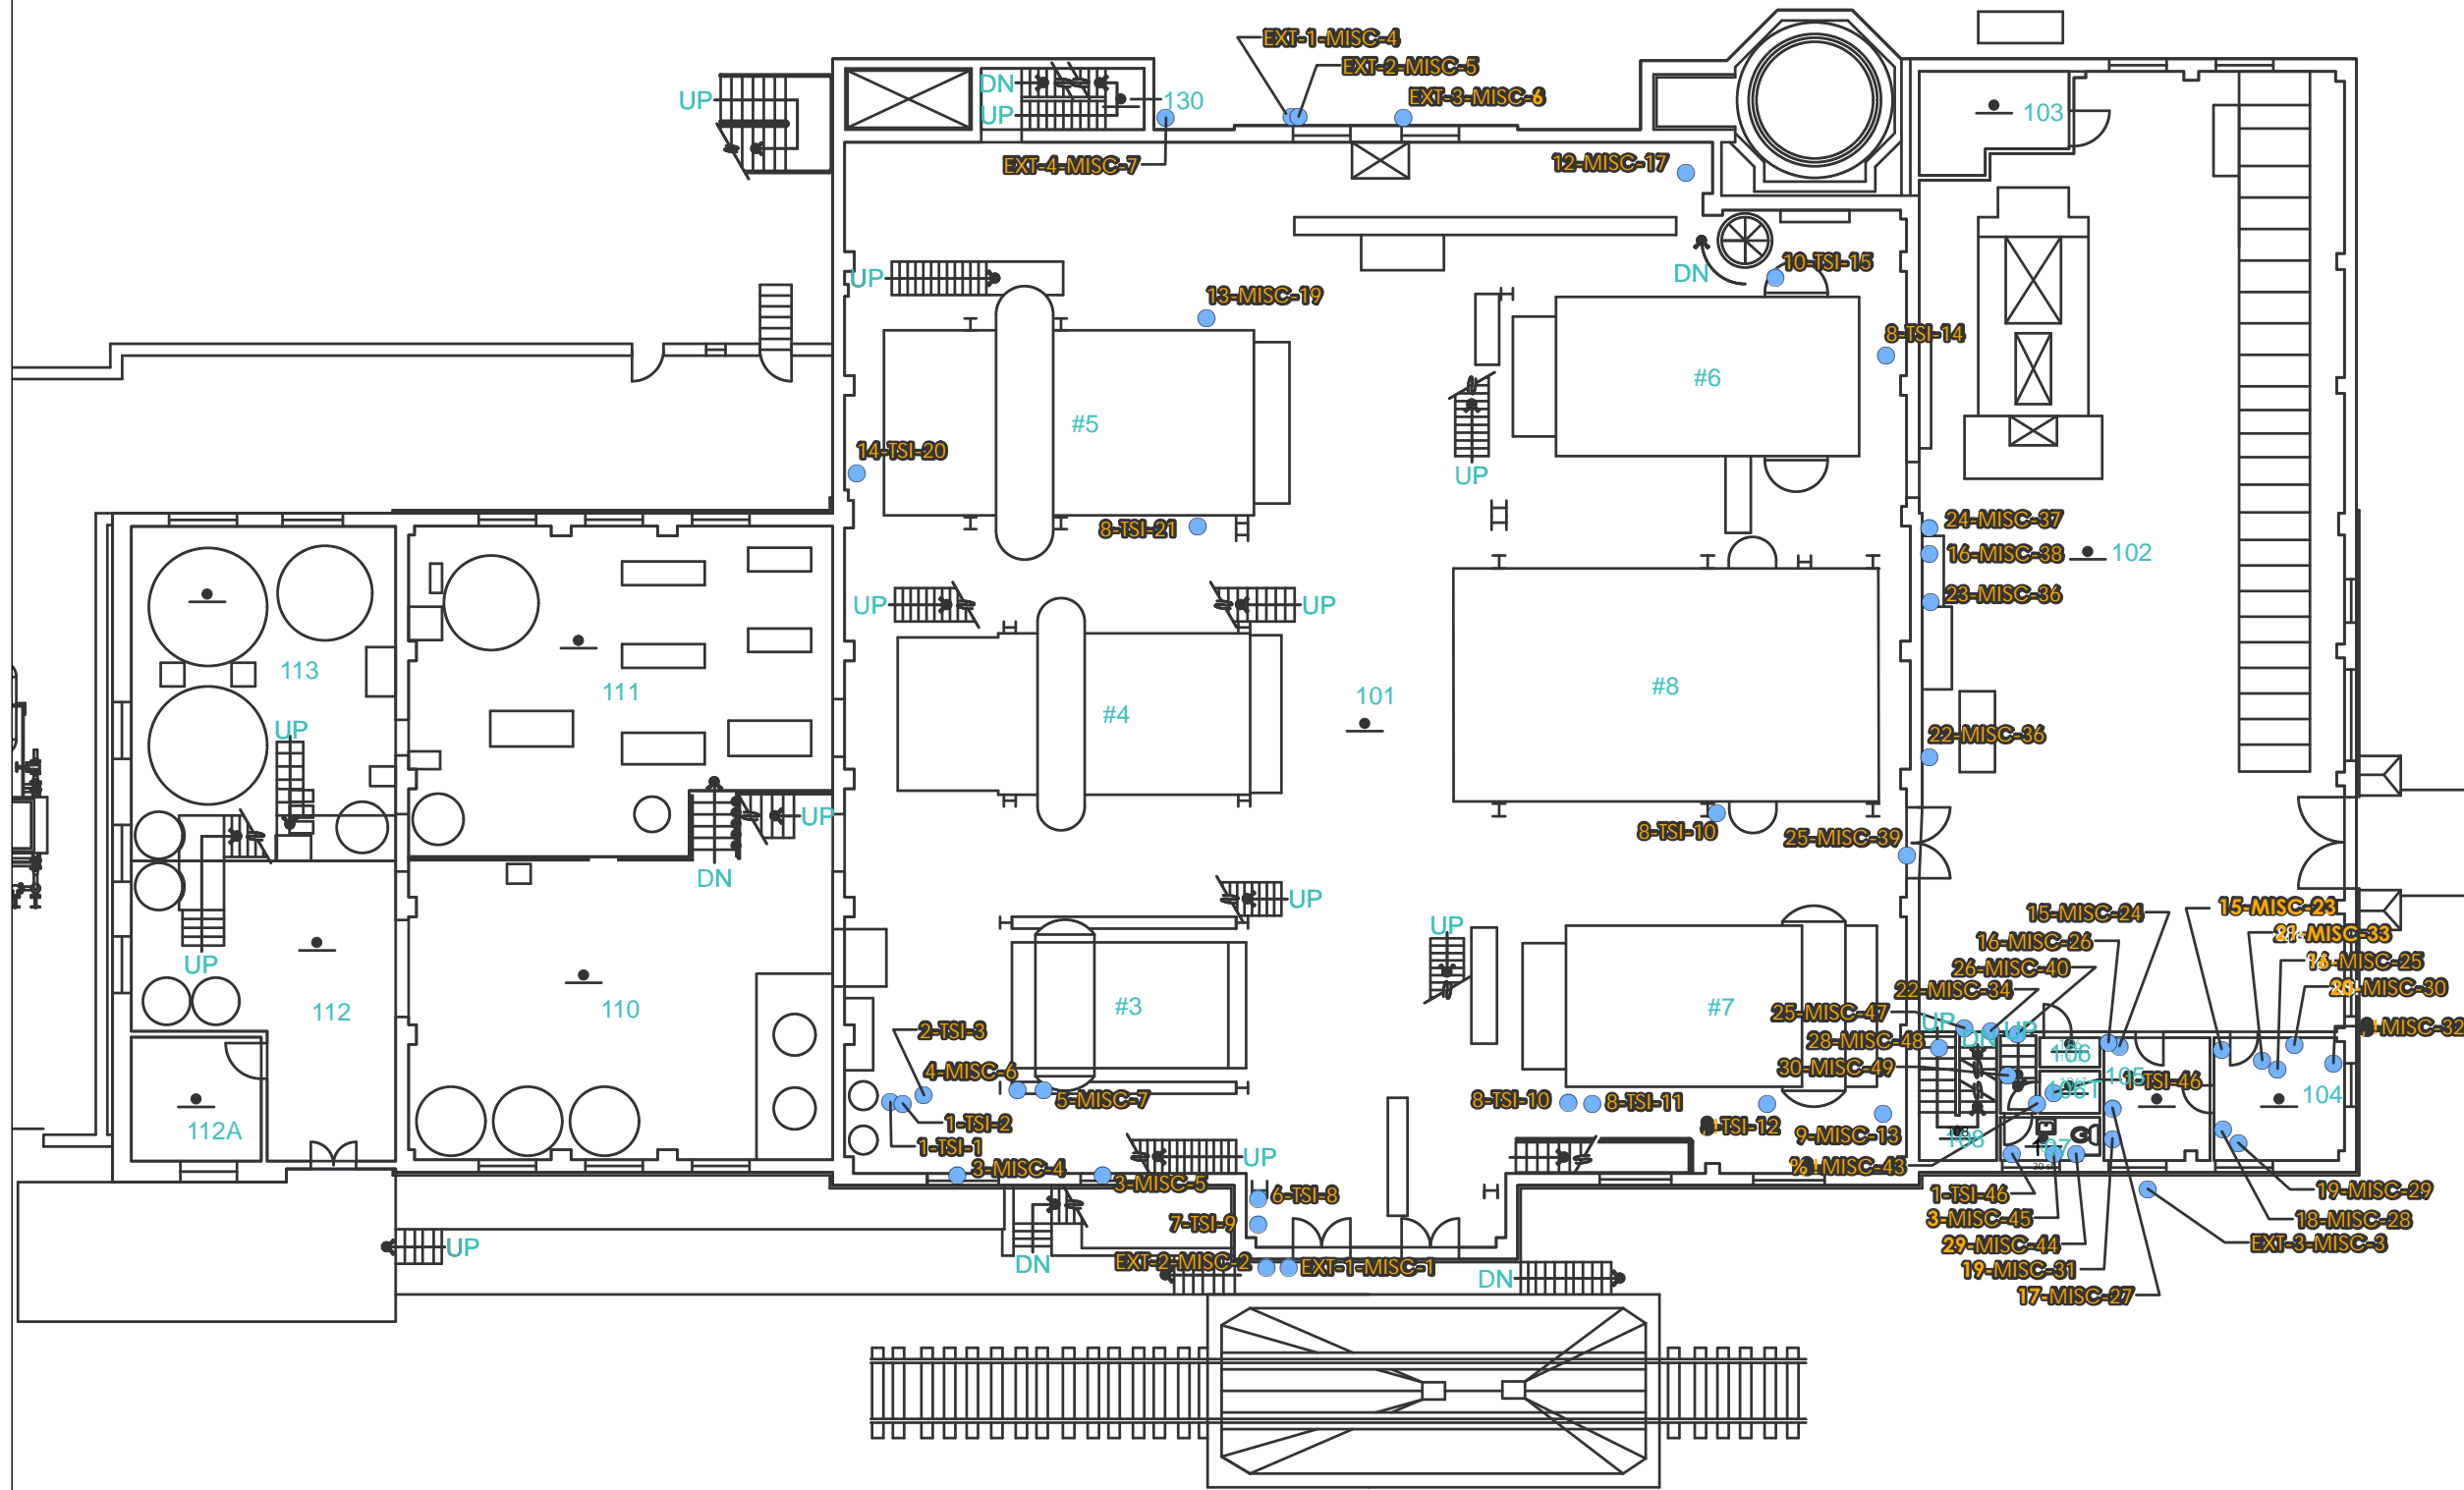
First Floor and Exterior Sampling Locations - Asbestos
